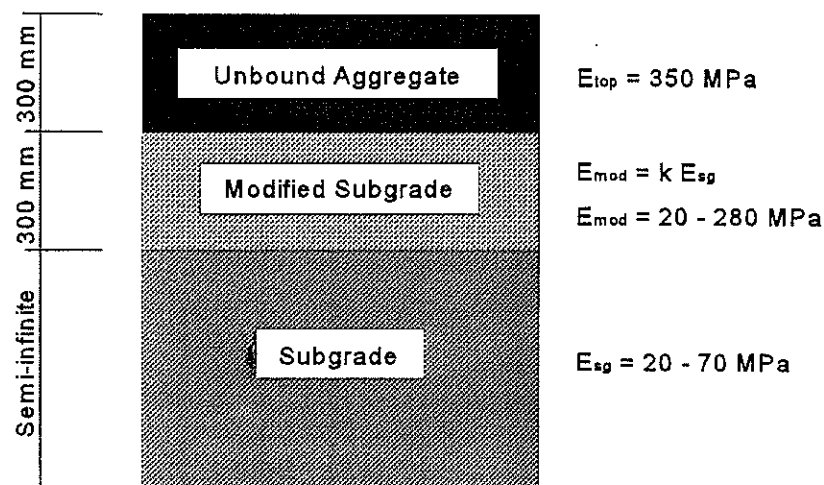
Pavement configurations used in analysis summarised in Figure 4.1.
